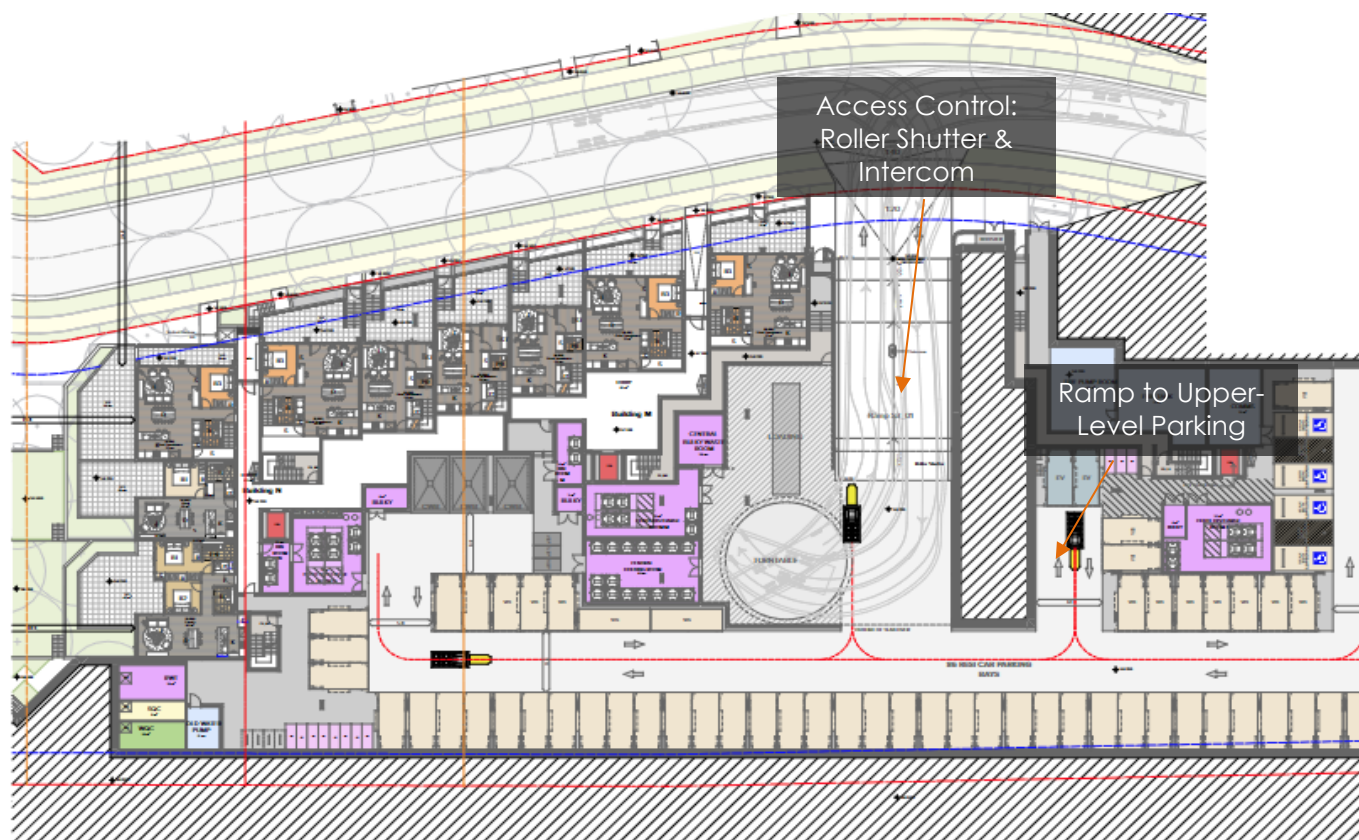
Extract Buildings K, L, M and N Car Parking [RL 56.70] (Source: Turner, 2024)
